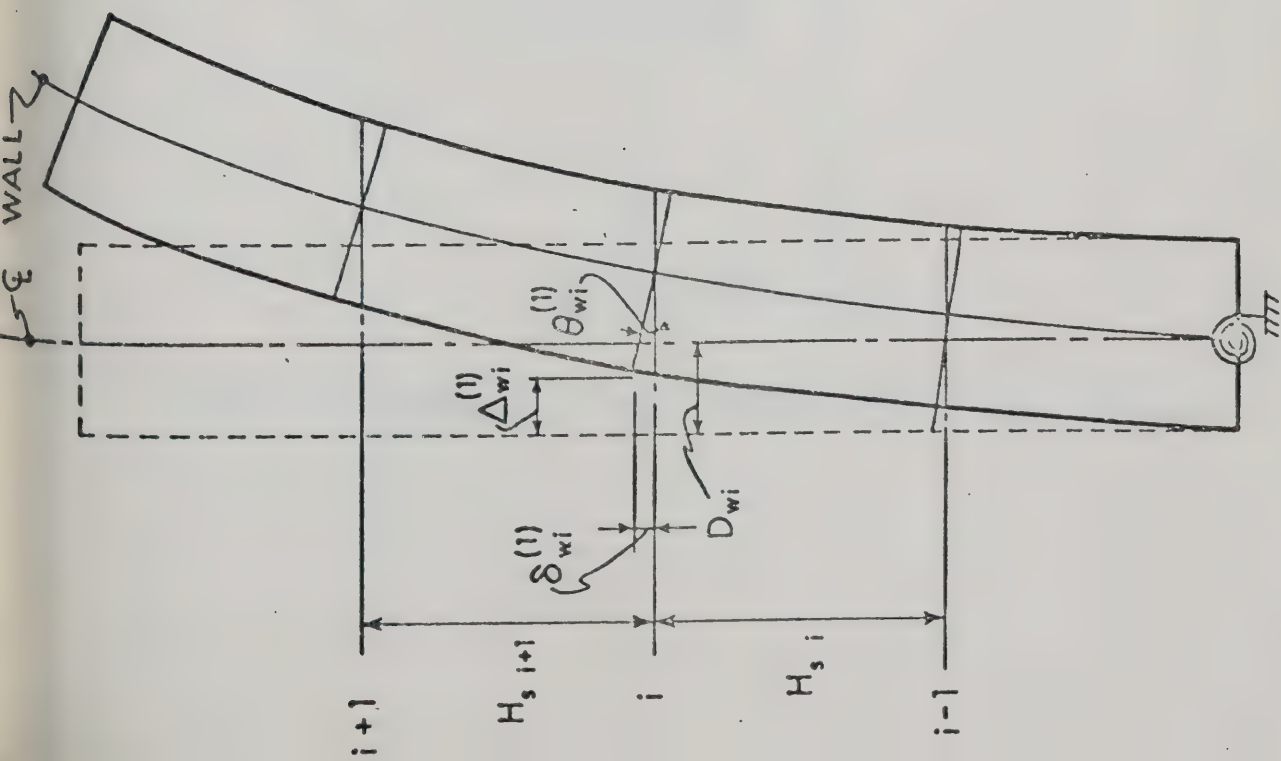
SHEAR WALL UNDER LATERAL LOAD
